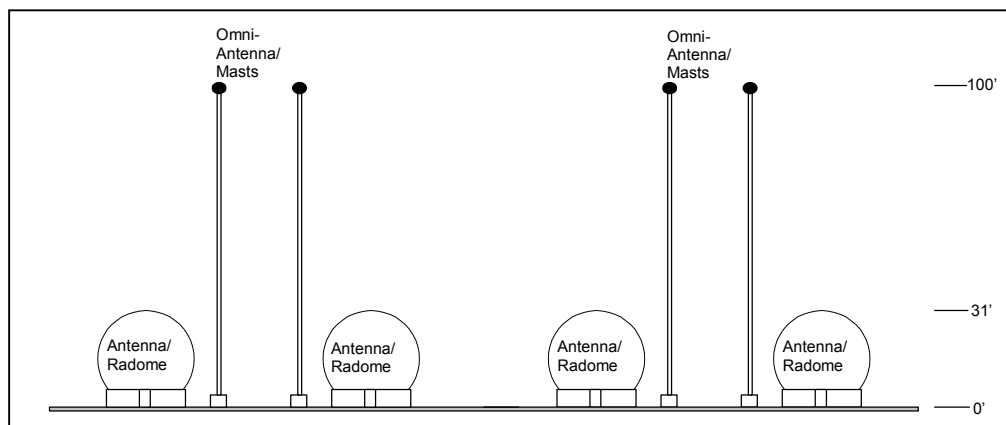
Elevation detail of antennas for proposed WR CT Site.
